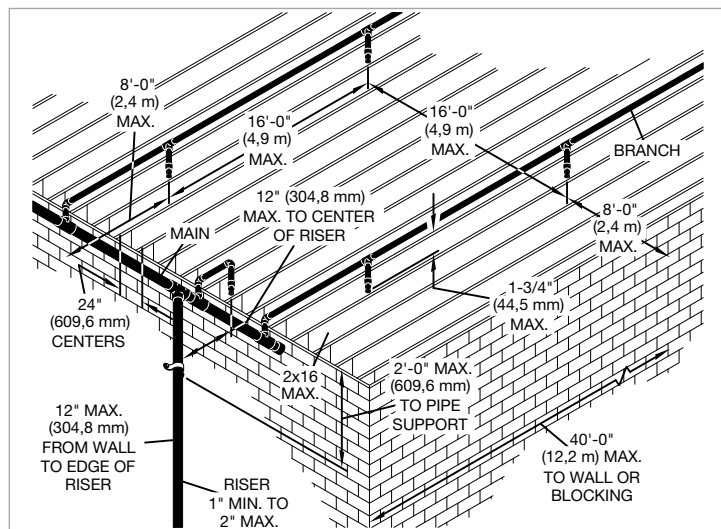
Unfinished Basement, Solid Wood Joists, Riser in Corner
